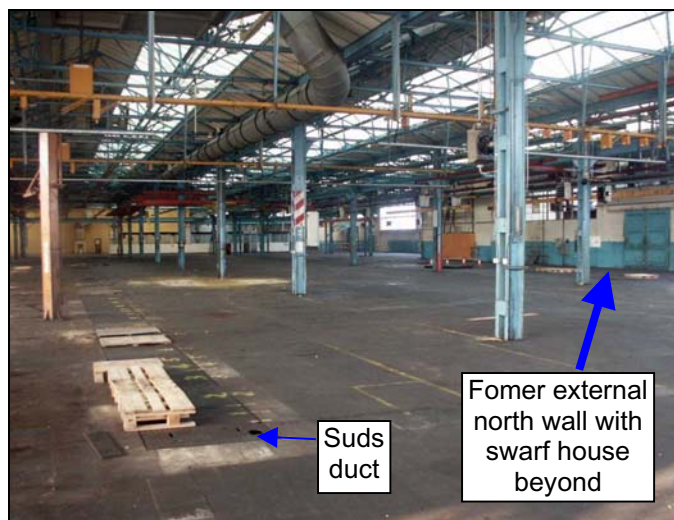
Northeast corner of Building 2, with suds house and loading bay
